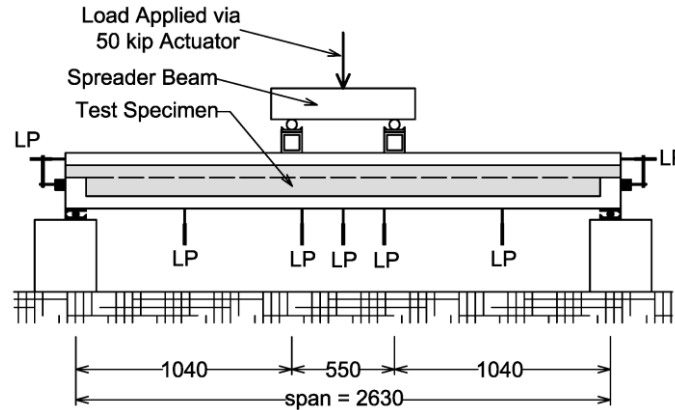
Test apparatus for simply supported flexure tests, all dimensions in mm (100 mm = 3.94 in)
